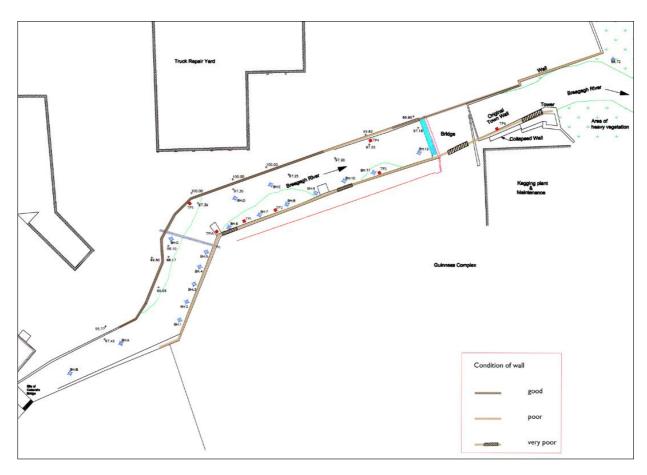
Plan showing Condition of City Wall September 1999, courtesy of Margaret Gowen & Co Ltd
